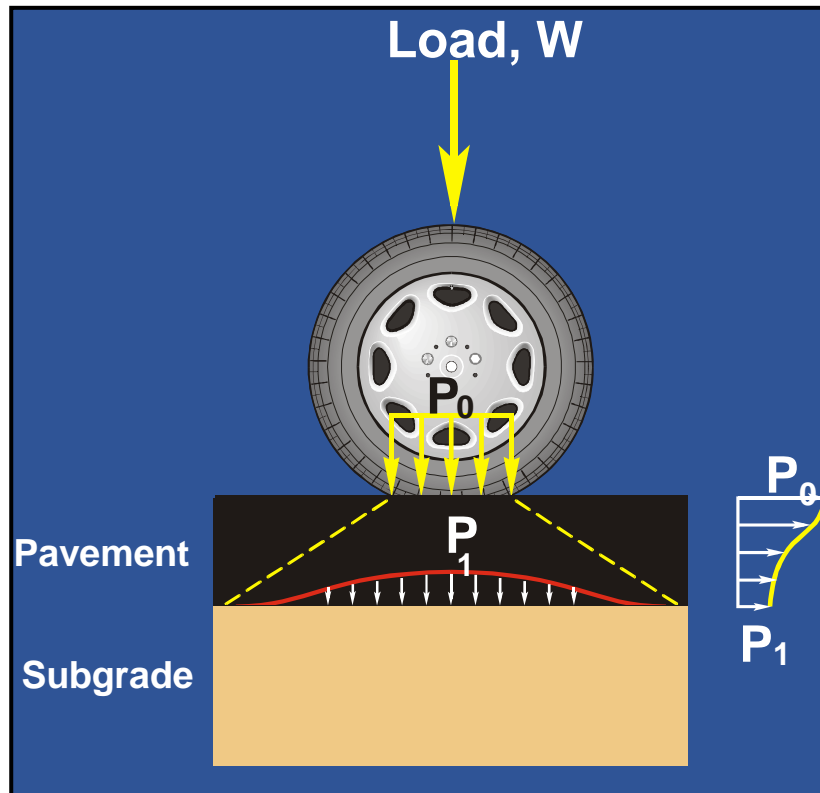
Distribution of loading (stress) through the pavement layers.
